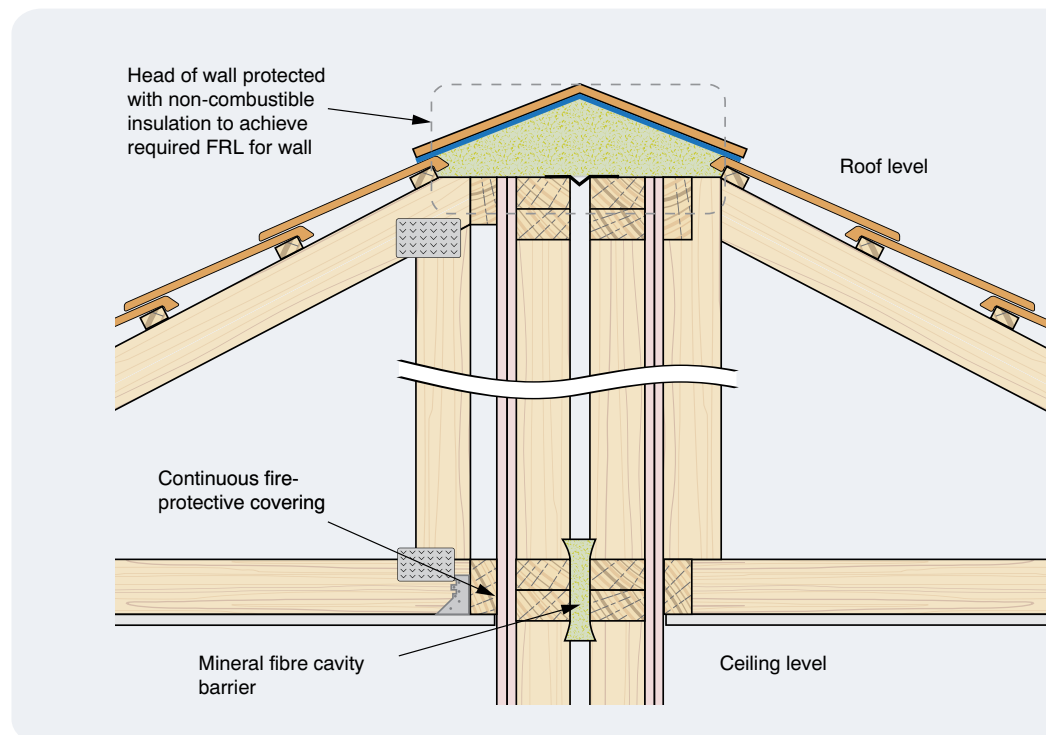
Roof space option 1 extending SOU bounding fire-protected timber walls to roof level.
